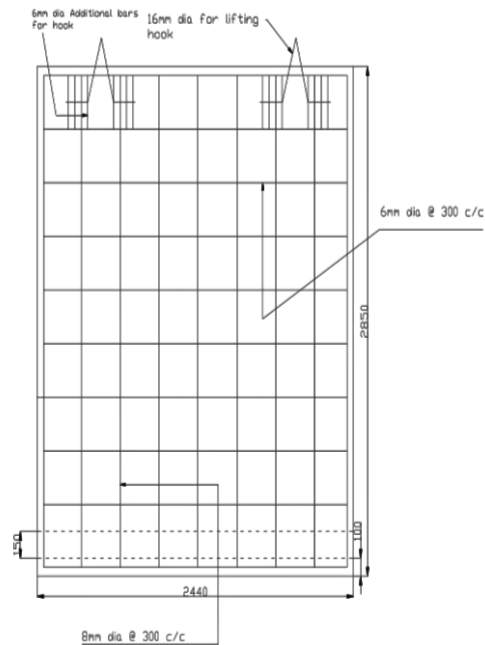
Arrangement of Rebars in Wall Panel (Plan)
